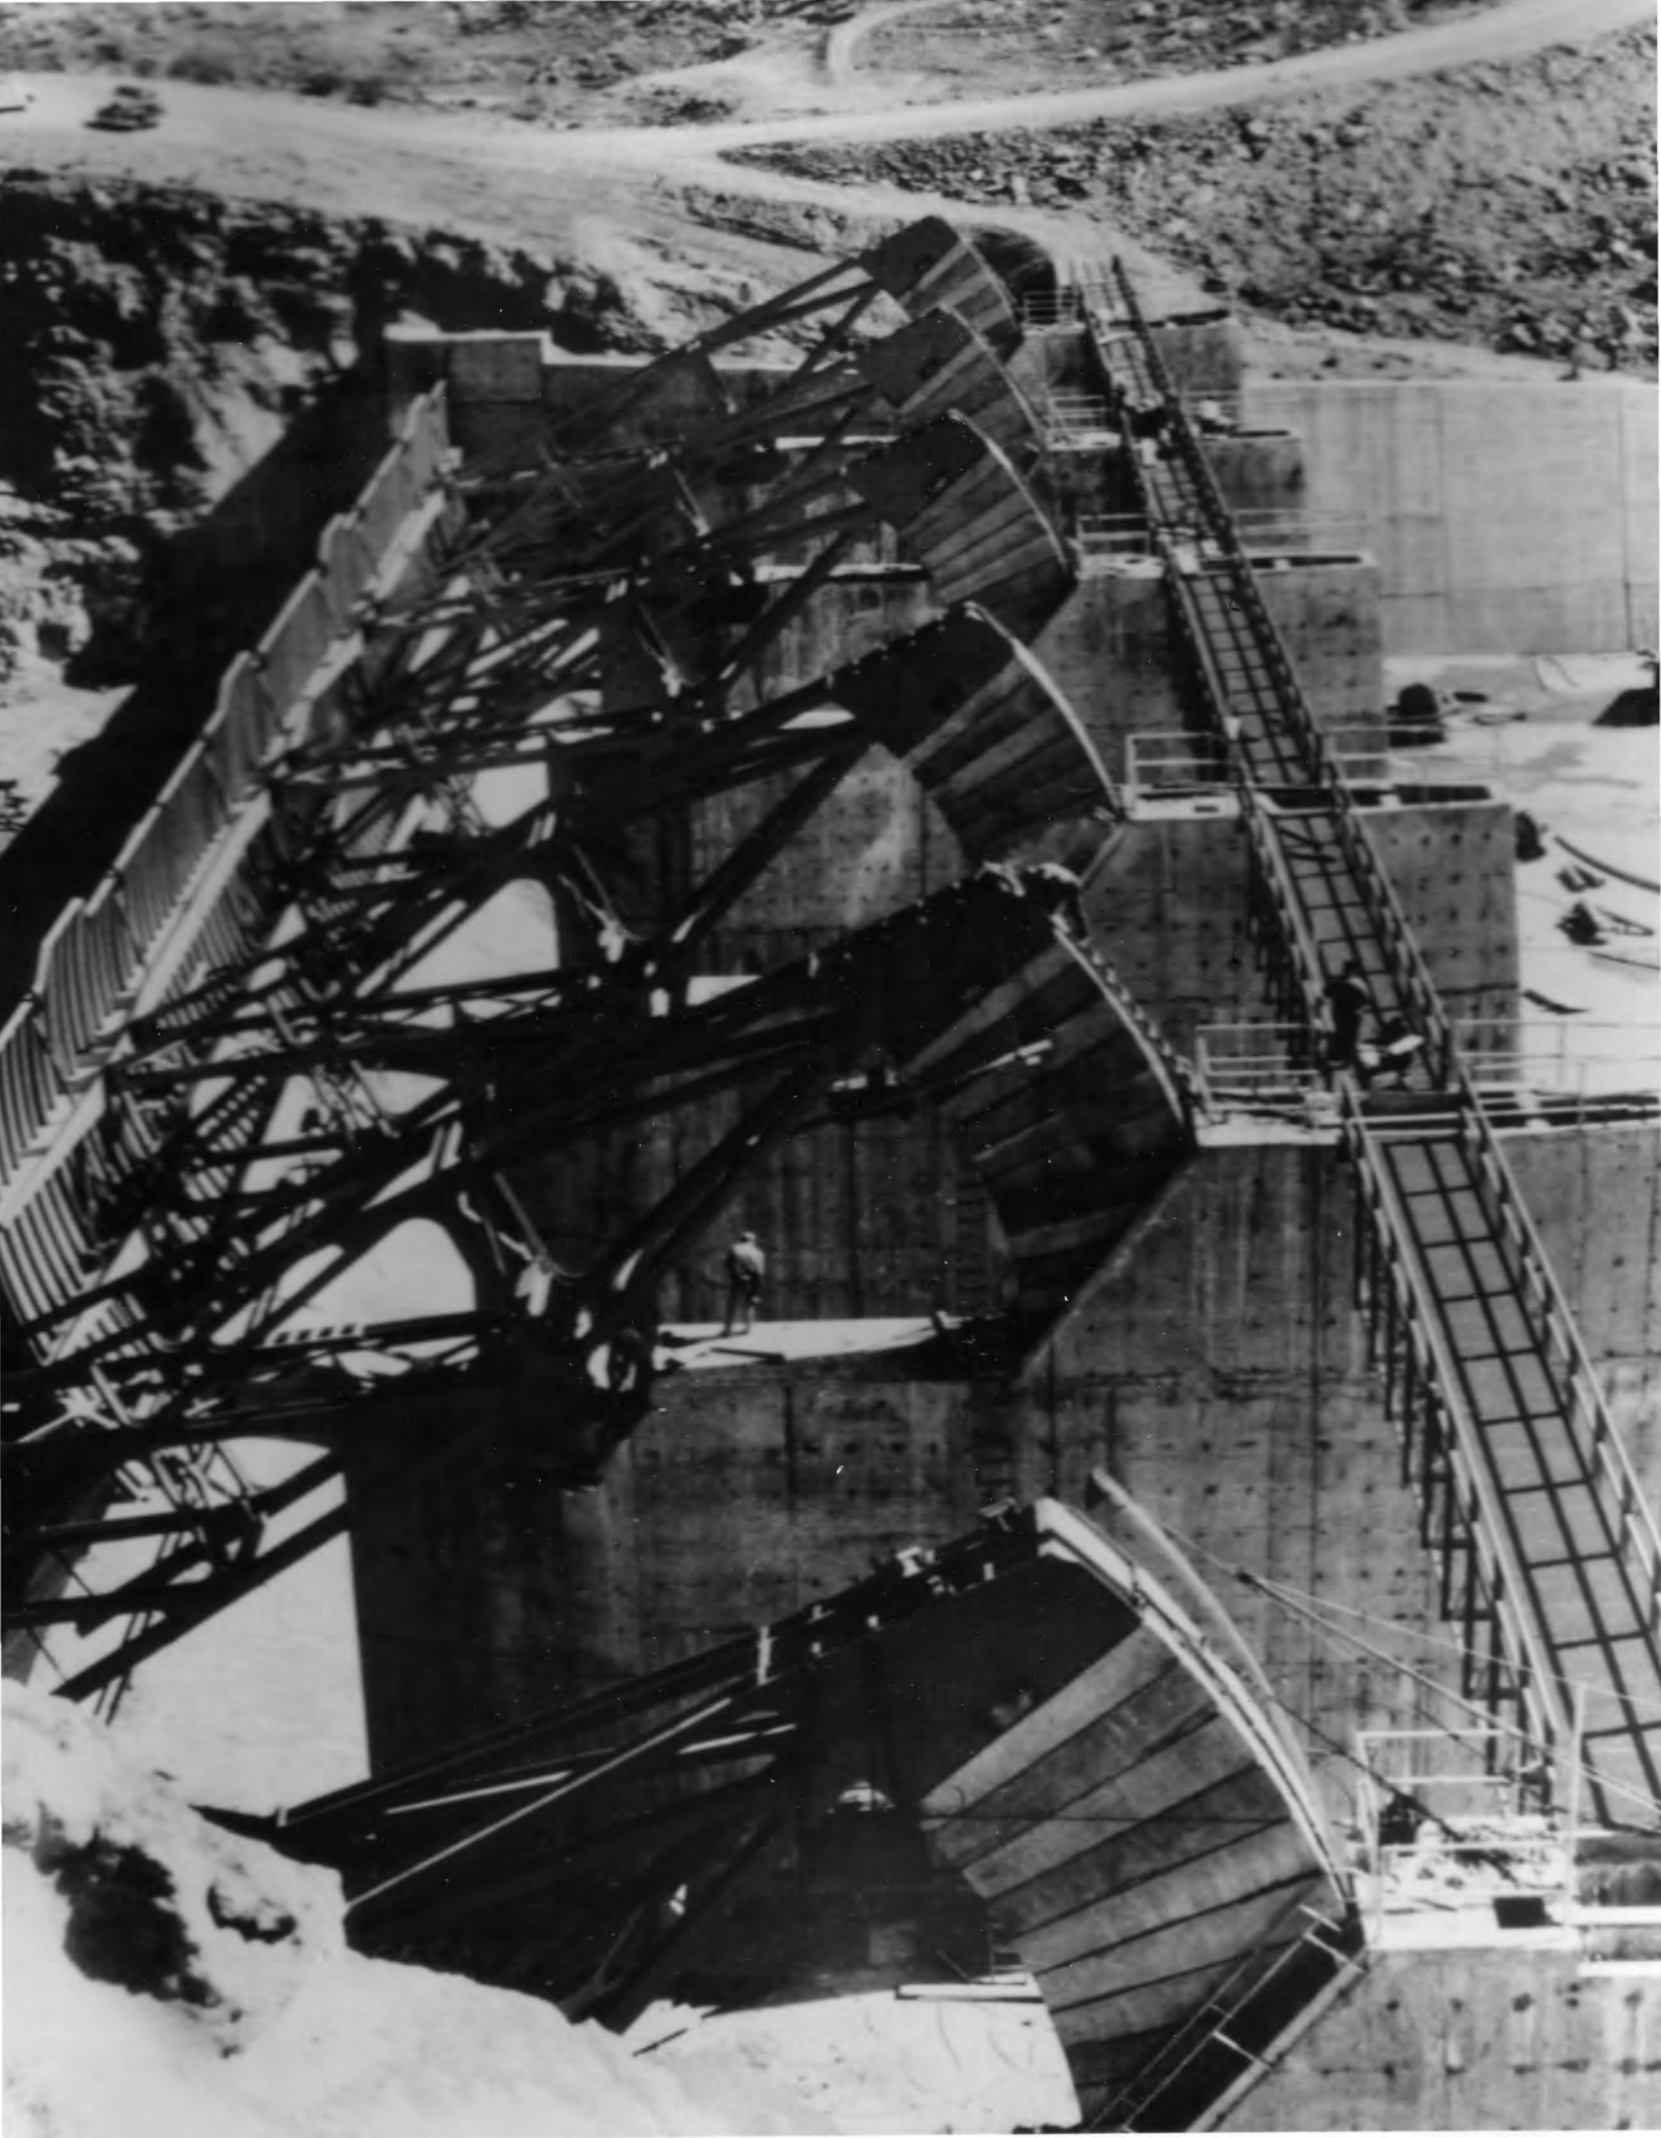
GATES UNDER CONSTRUCTION. 21 February 1950.
